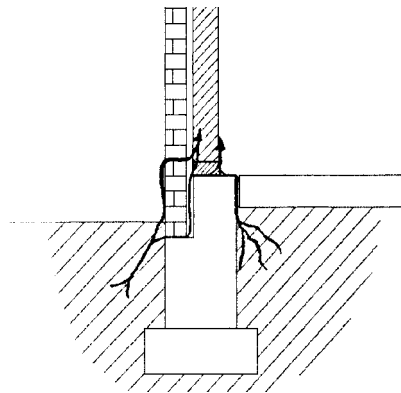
Poured foundation—brick veneer (arrows indicate possible termite entry points).
